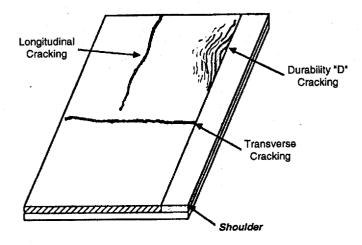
Surface defects of continuously reinforced concrete pavement
